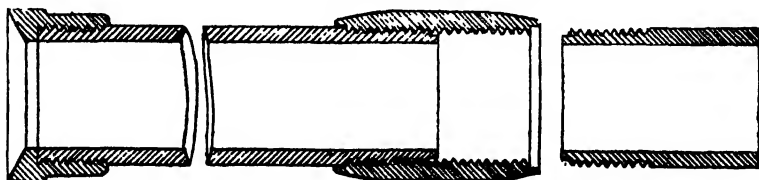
HEAVY DRIVE PIPE FITTED WITH DRIVING SHOE.
